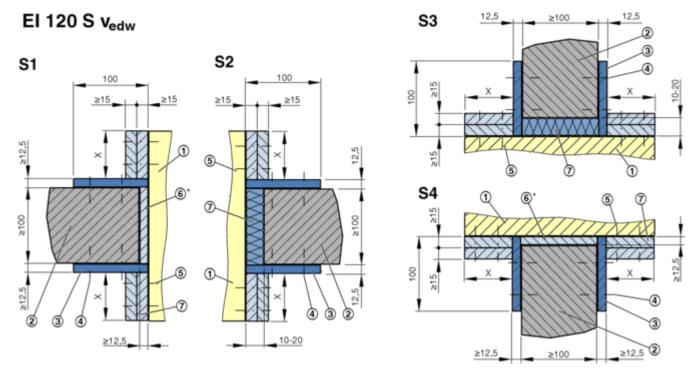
Details EK-JZ Dry mortarless installation in solid wall, solid shaft wall EI 120 S, legend & Fig. 23
